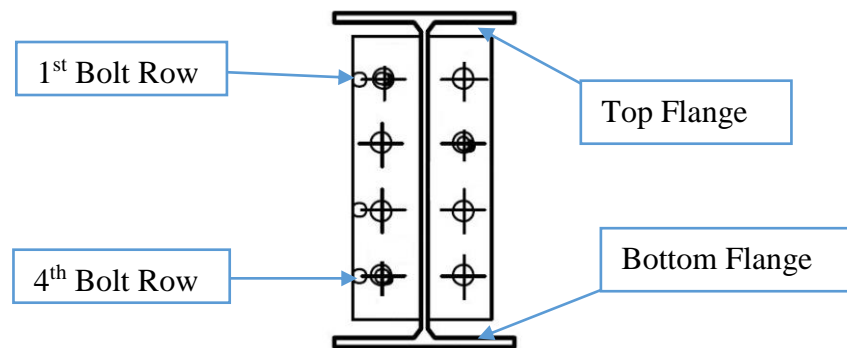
Cardington fire test layout (Wald et al., 2005)
